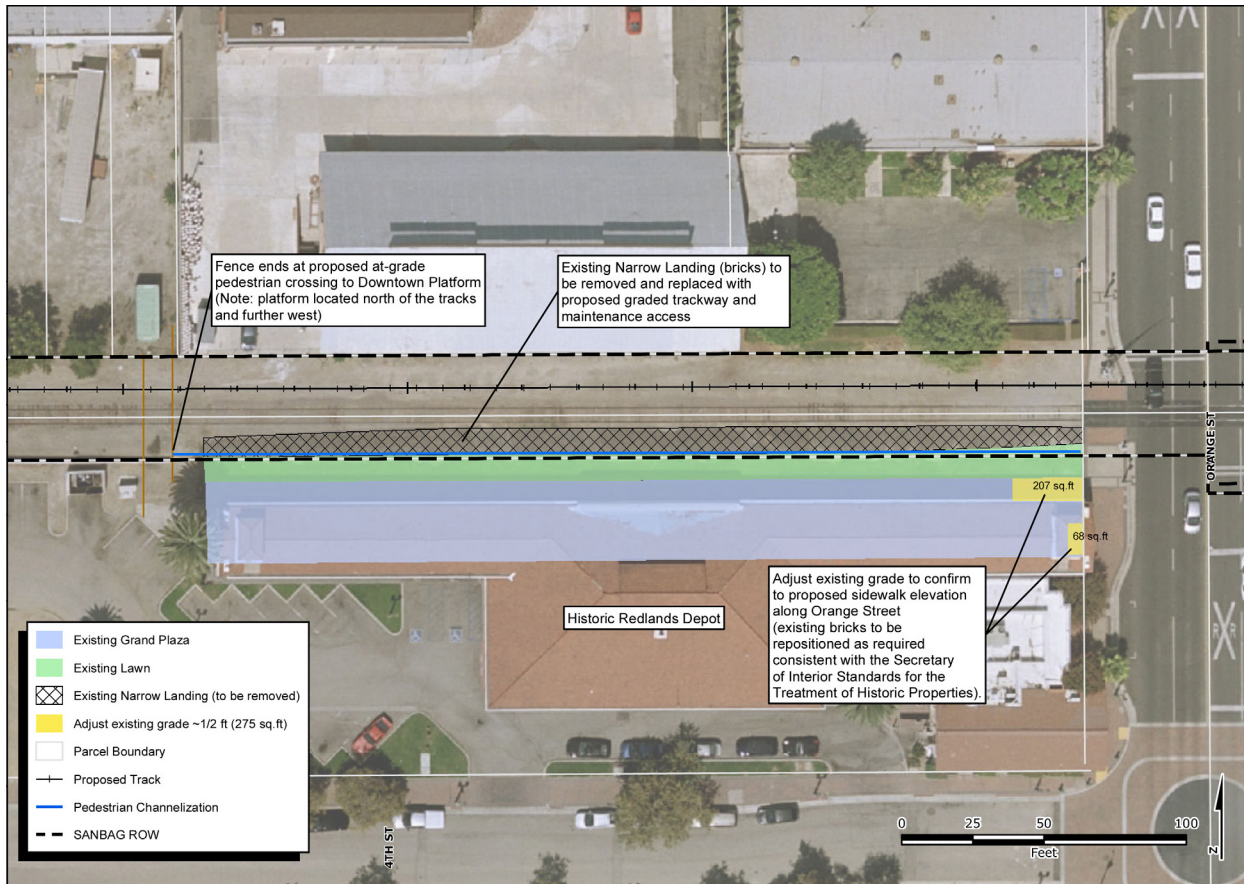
Redlands Santa Fe Station Proposed Conditions.
